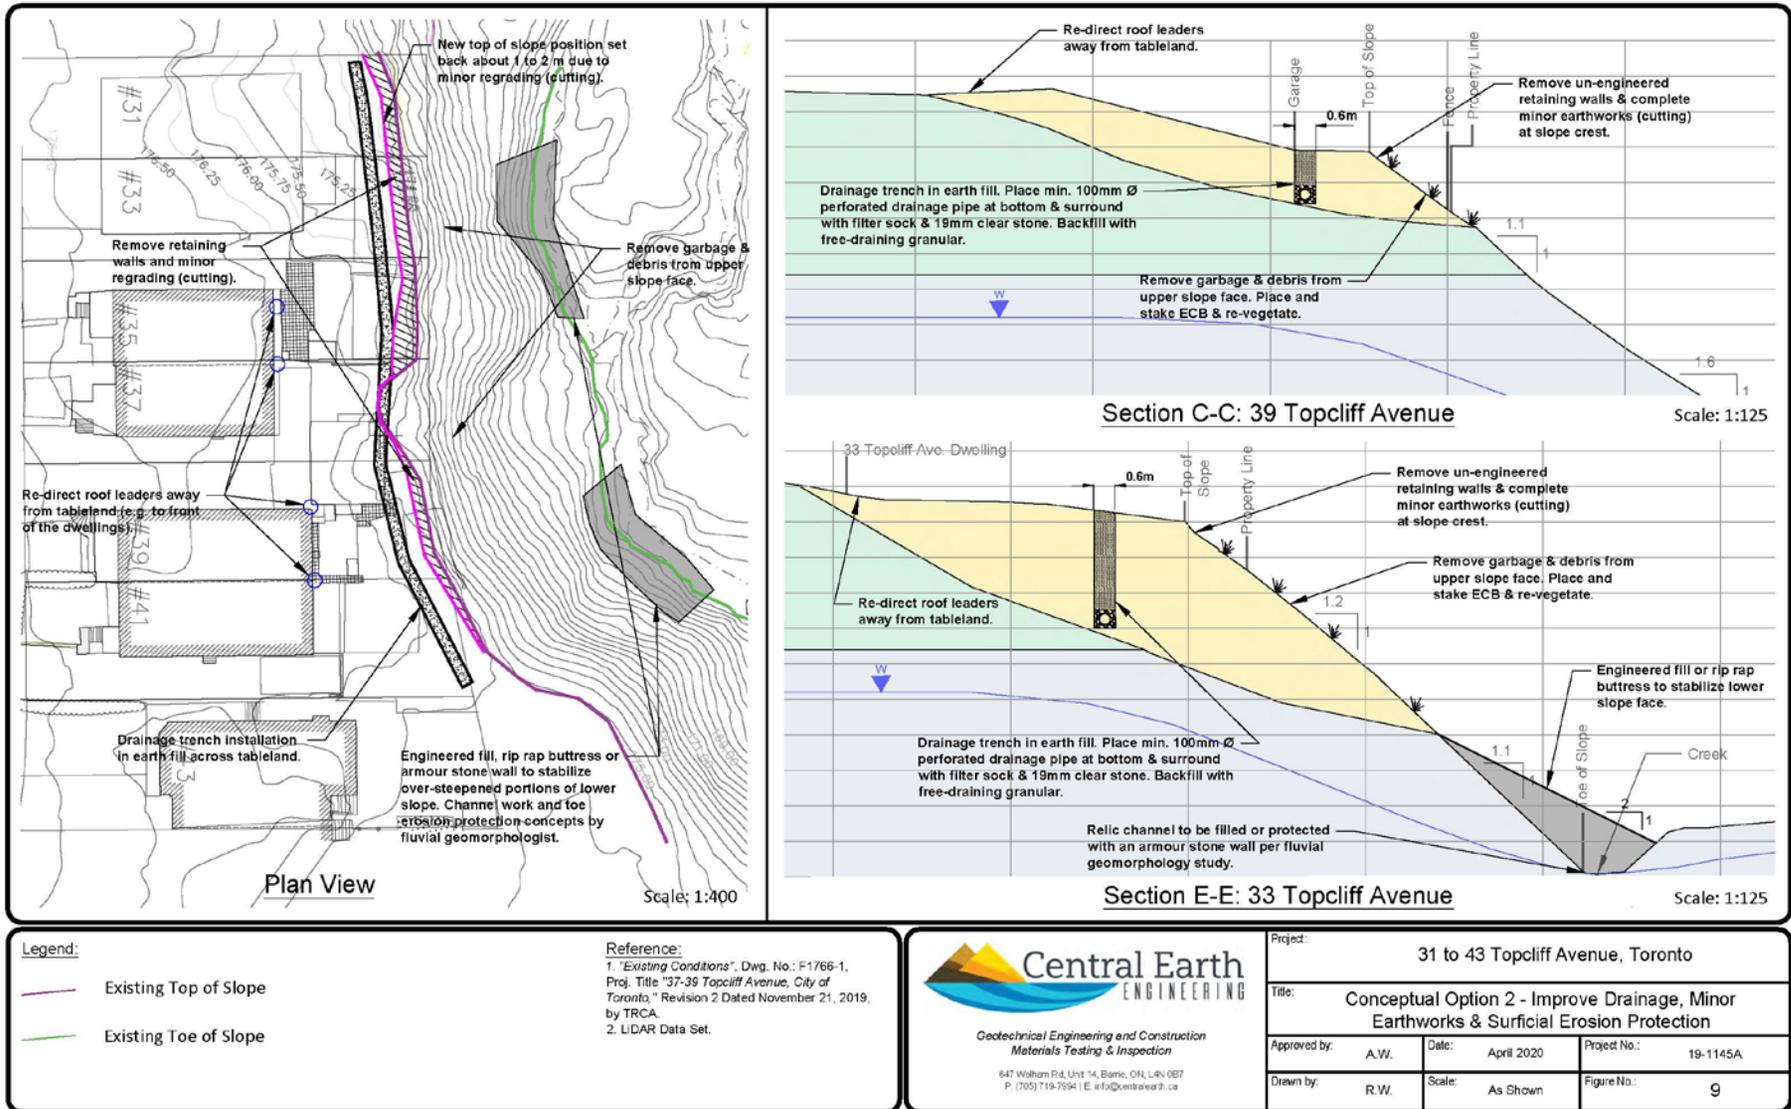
Concept 2 - Improvements for drainage with minor works and surface erosion protection. Source: (Central Earth Engineering, 2020)
